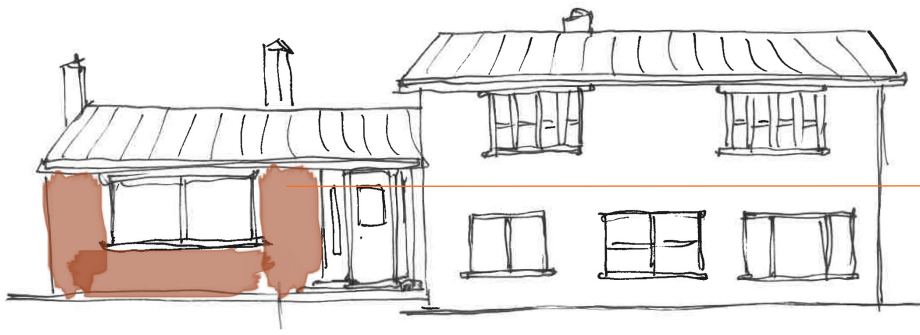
Sketch of Typical Residential Buildings along Walker Road.
